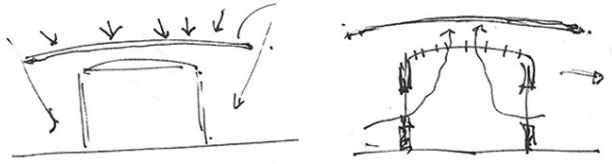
Double roof creates stack ventilation effect, Sketch, Author (2016)
